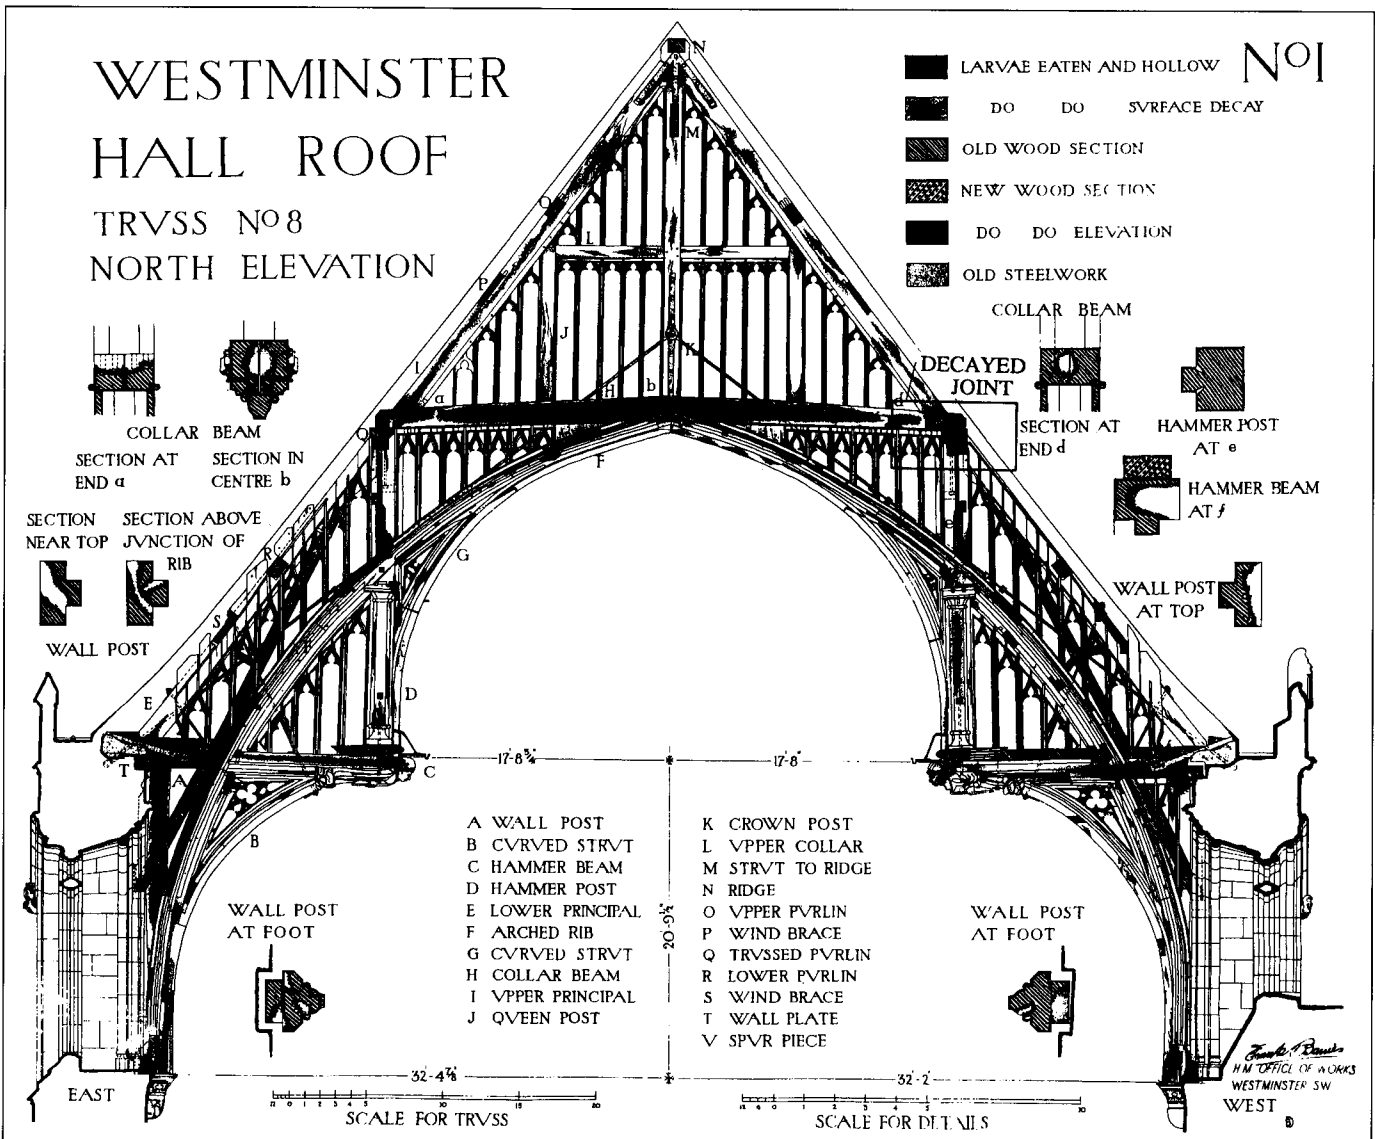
Sir Frank Baines, truss elevation and detail of collar beam, Westminster Hall roof, from Report on . . . Westminster Hall (1914).
